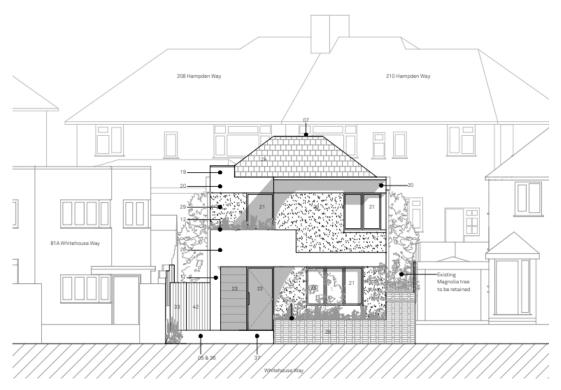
Proposed Front Elevation (Novak Hiles Architects)
